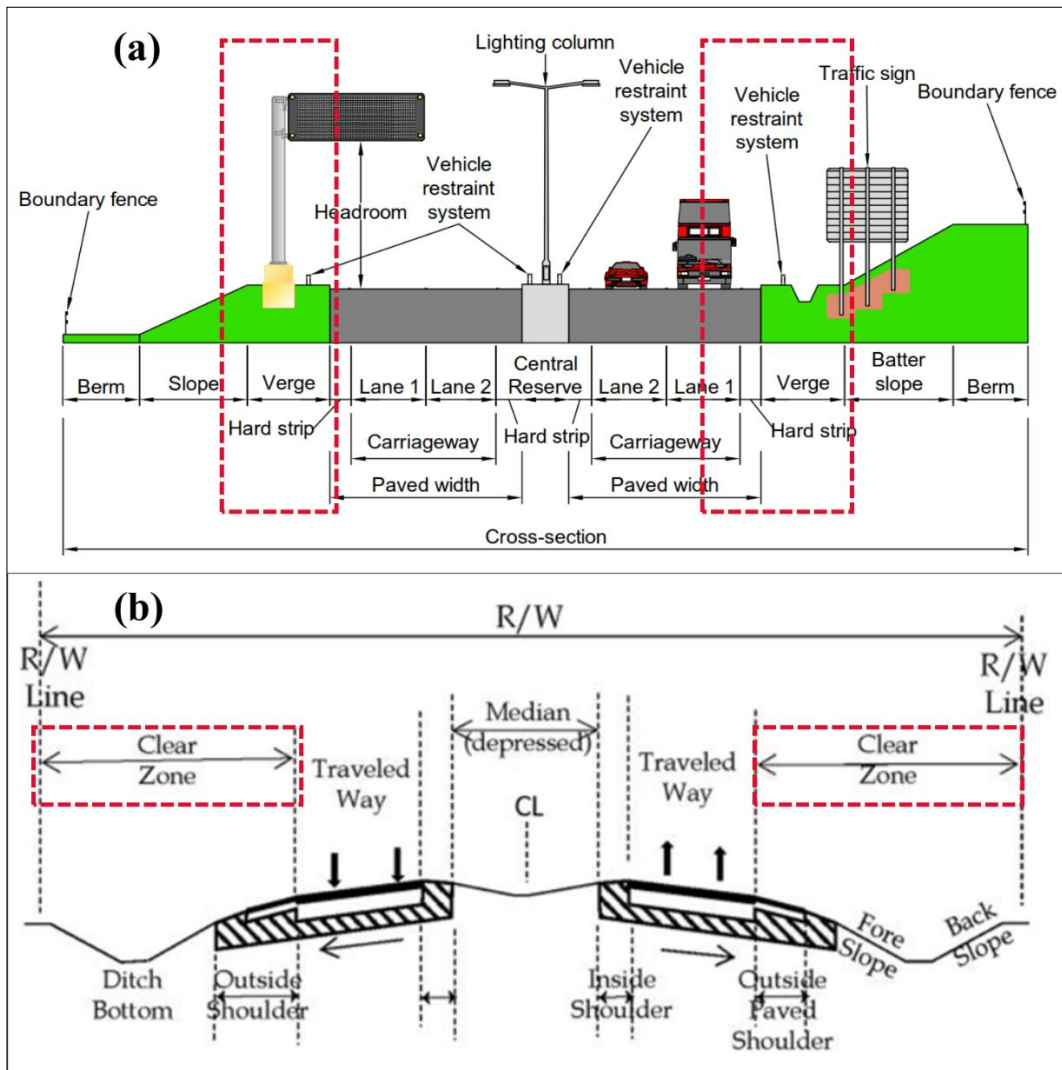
Typical rural divided road cross-section (a) in the UK (Highways England, 2021b) (b) in the USA (Tang & Zhang, 2021)
